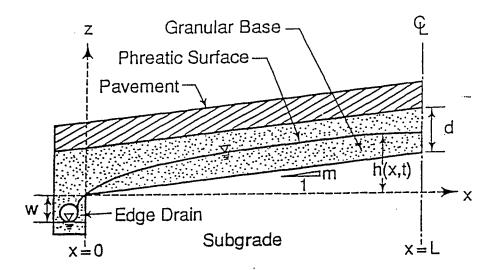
Pavement Cross Section as Used in Program SUBDRAIN (Source: McEnroe and Zou, 1993)
